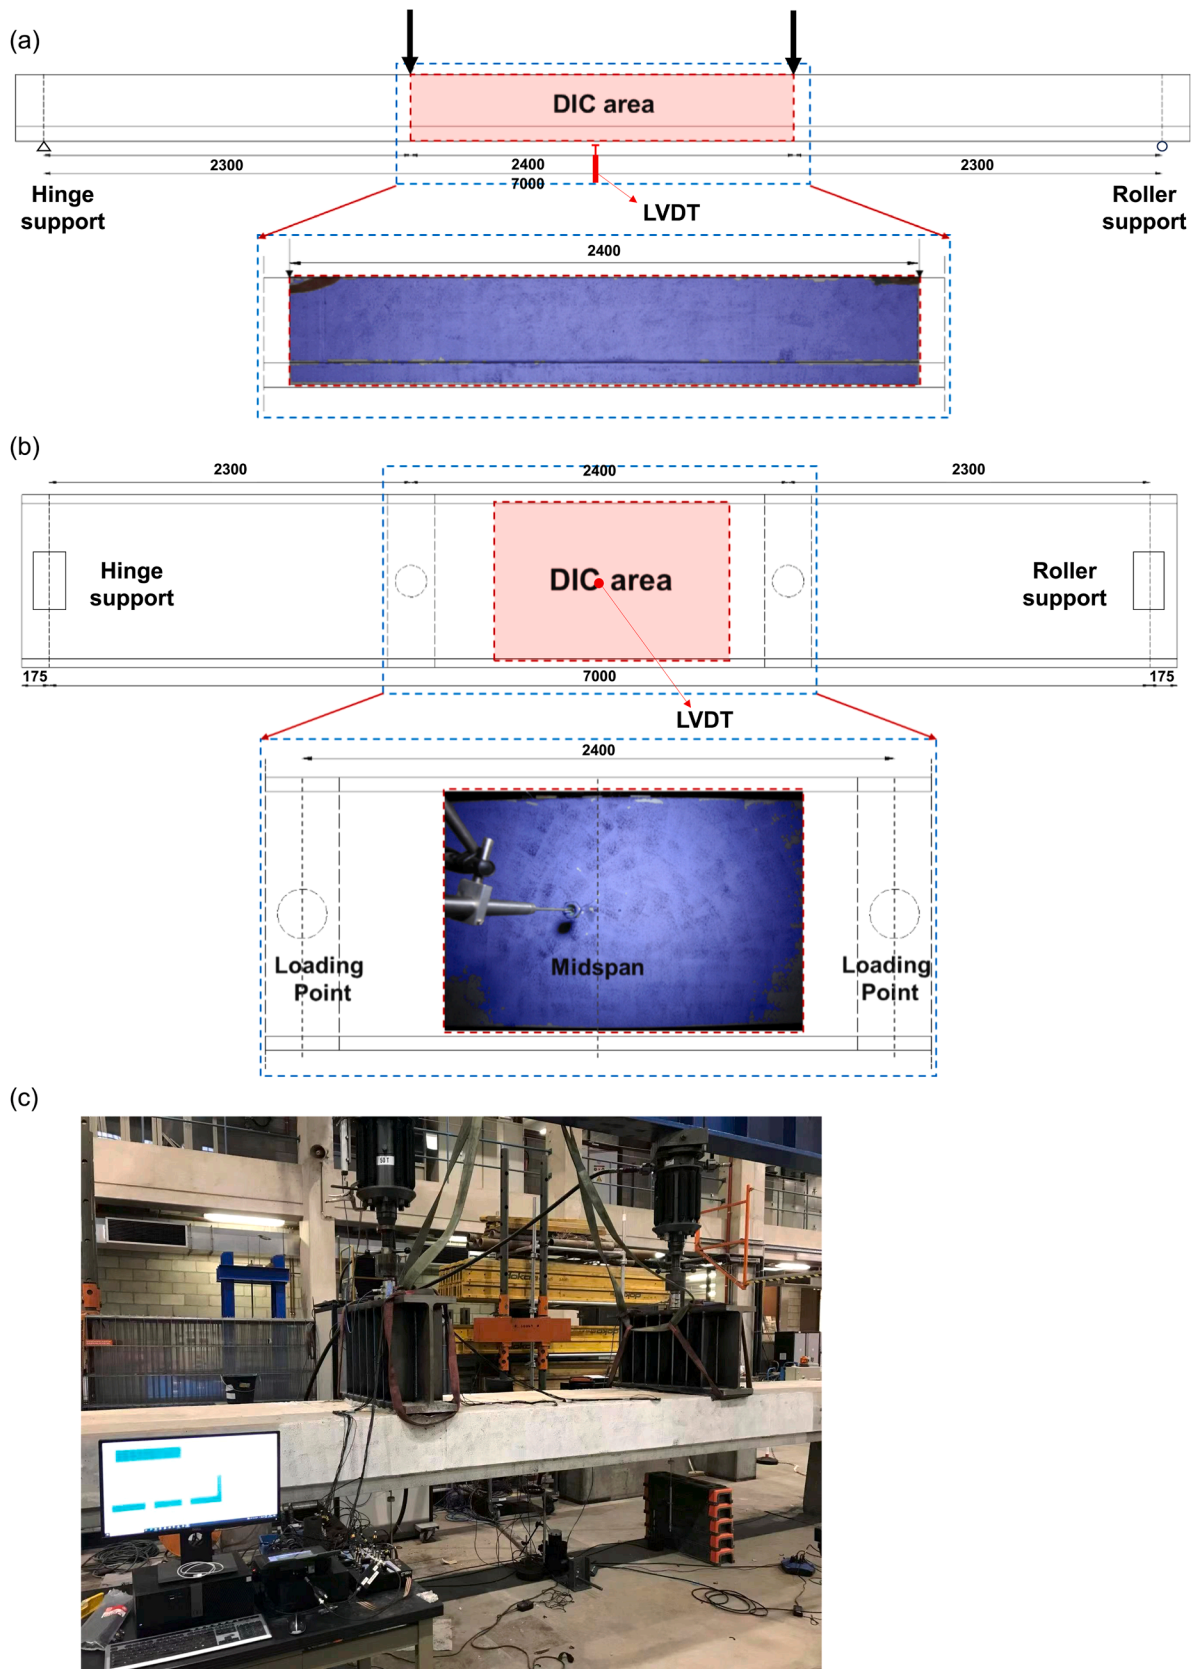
Flexural test setup for the AAC composite beam. (a) Front view (unit: mm). (b) Bottom view (the red dot indicates the location of vertical LVDT for measuring deflection; unit: mm). (c) Photo of the test setup.
